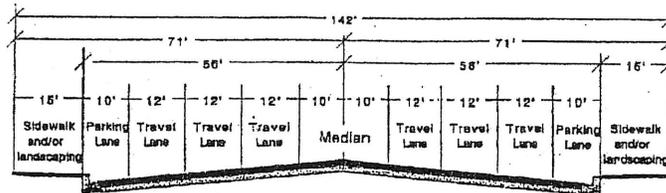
TOWN OF APPLE VALLEY GENERAL PLAN CIRCULATION ELEMENT
